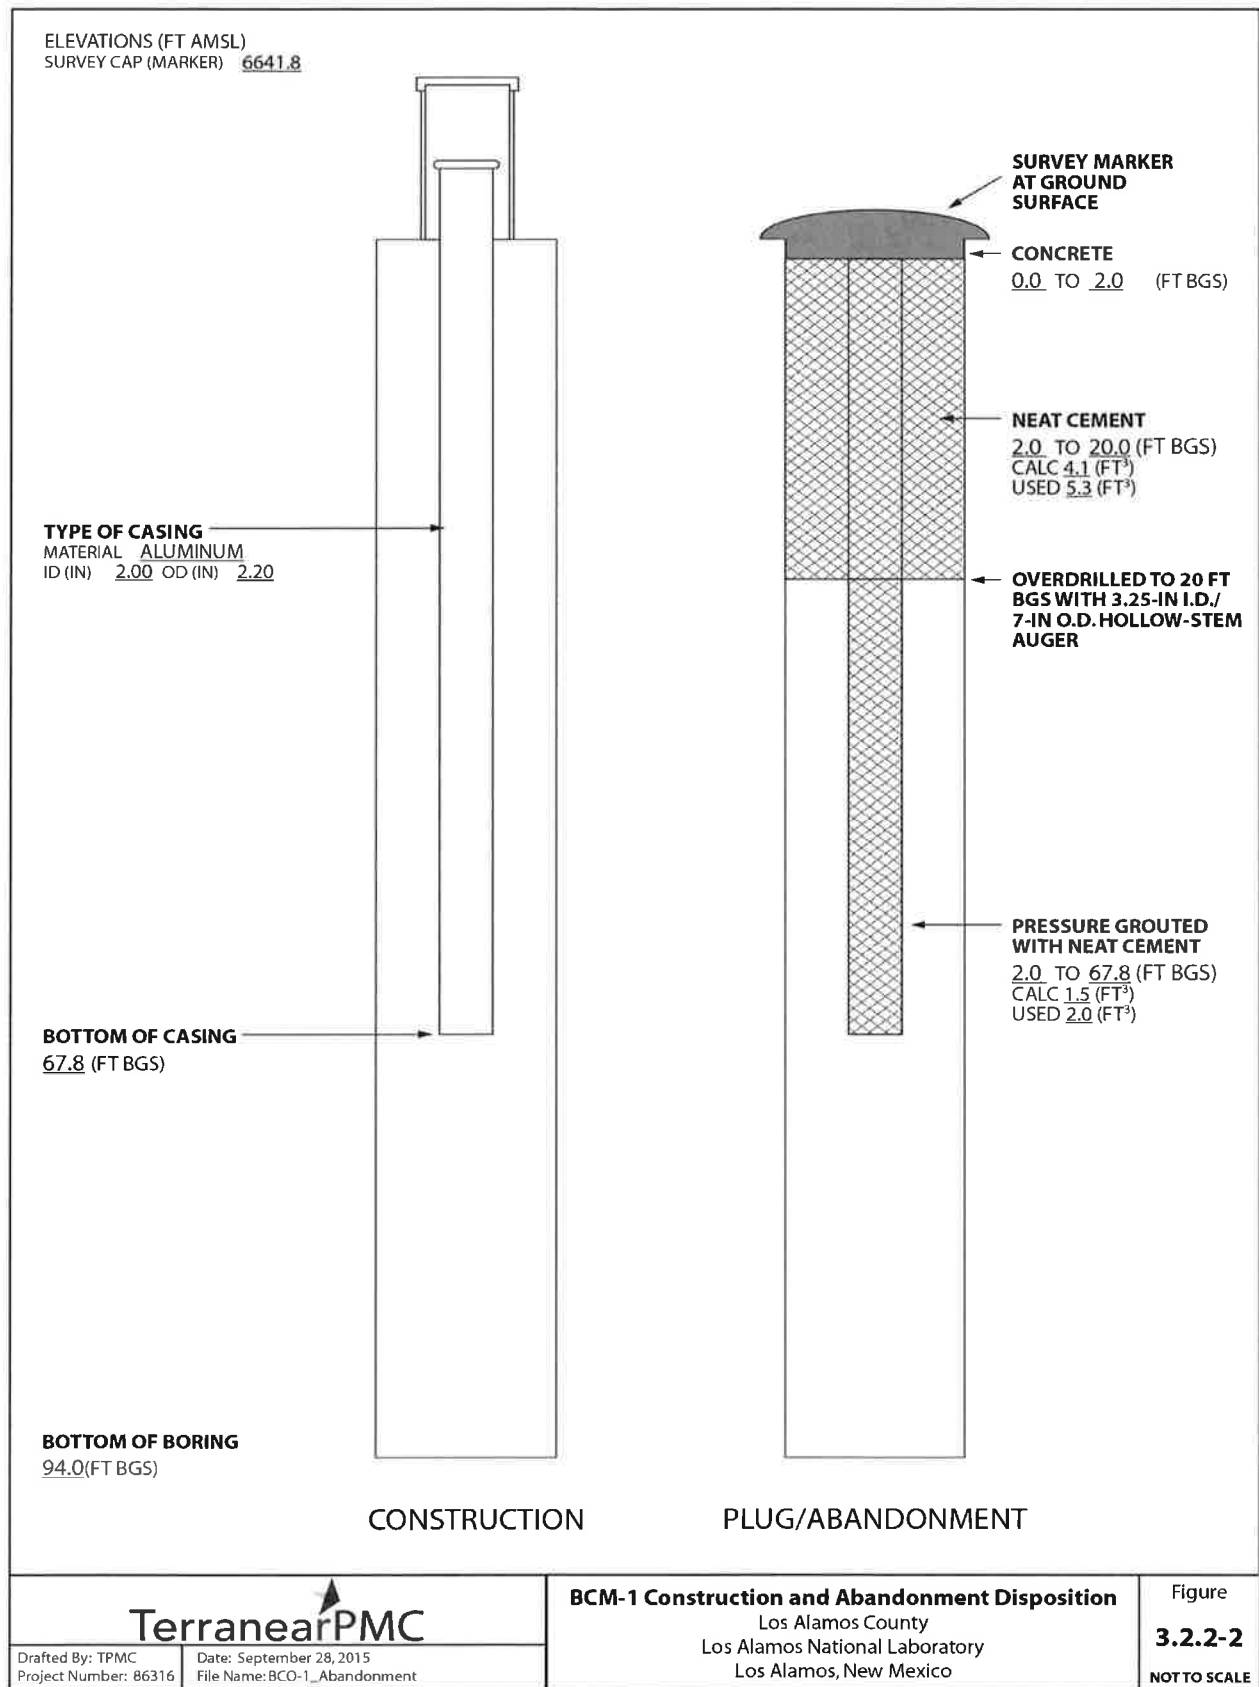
BCM-1 Construction and Abandonment Disposition
